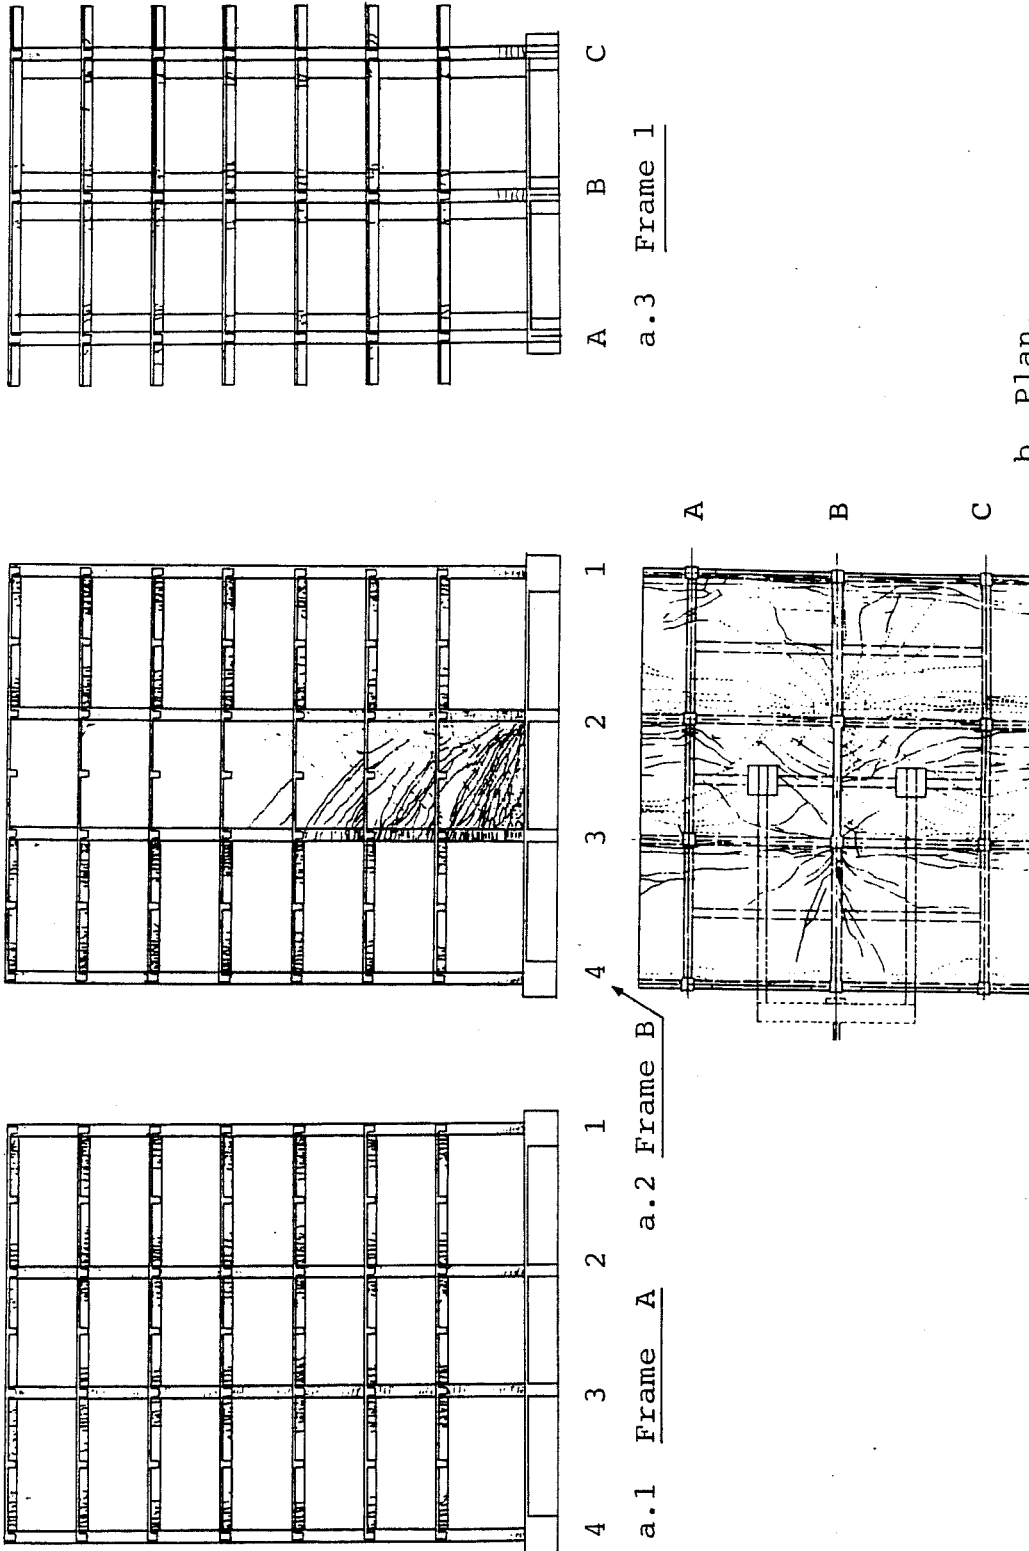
BRI Building Cracking Patterns (PSD 4) .
